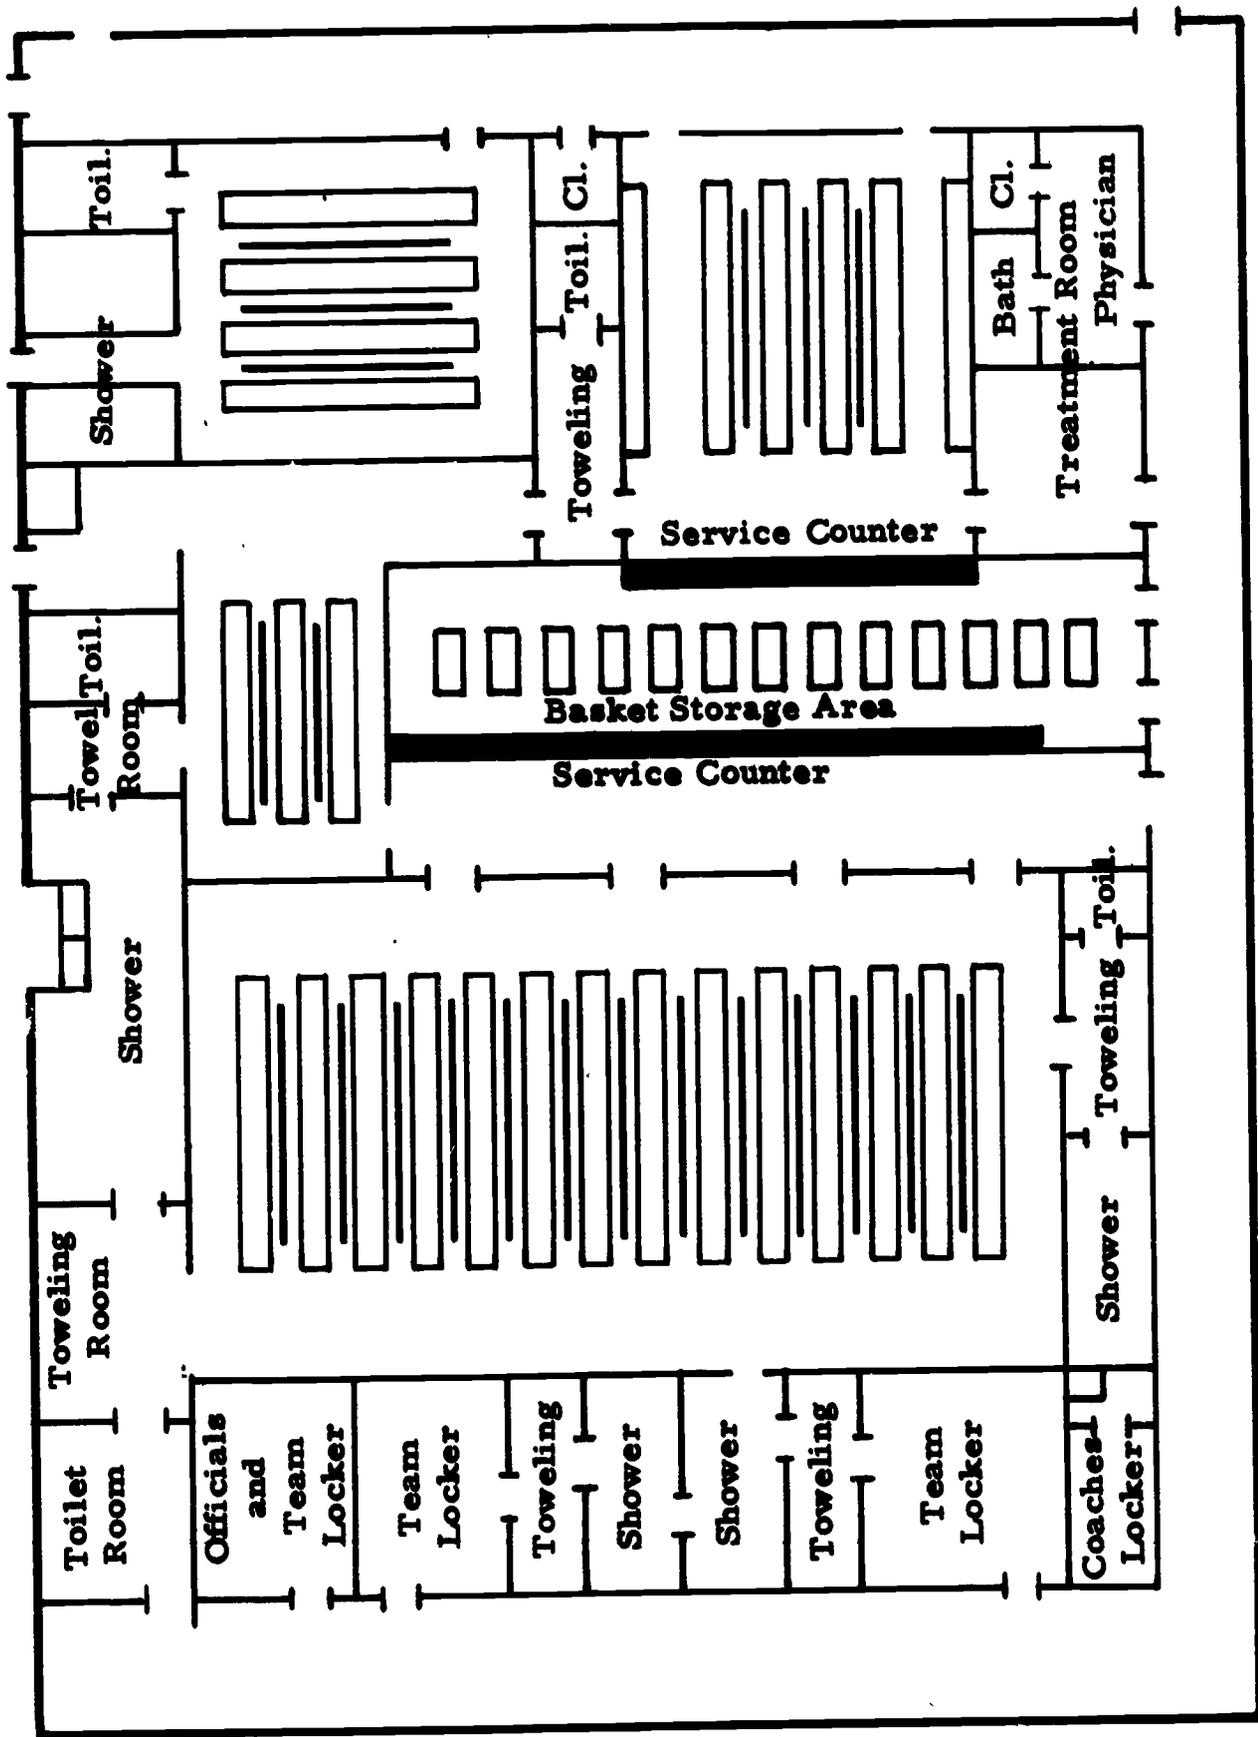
Locker Room Floor Layout, University of North Carolina
